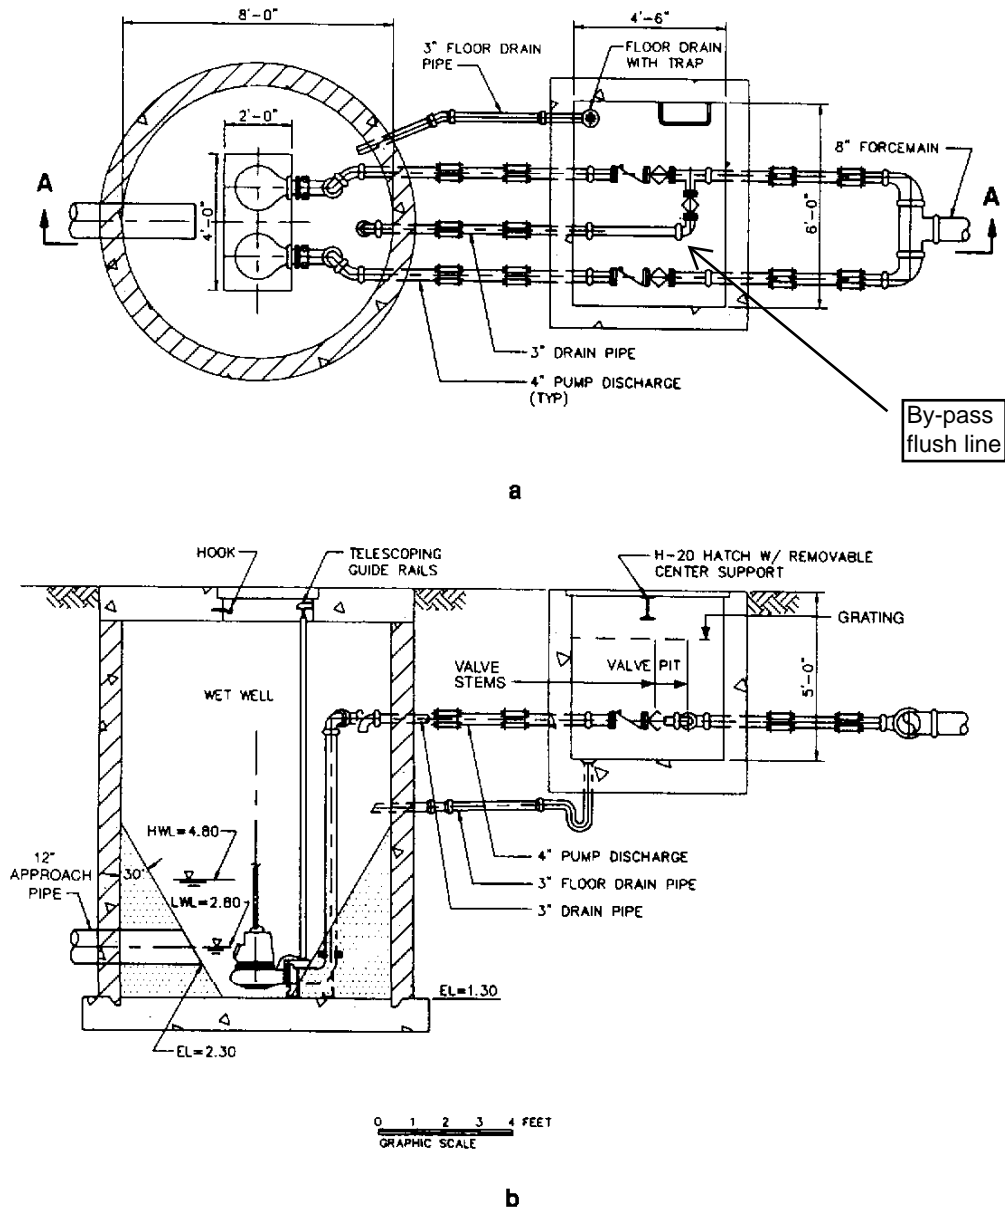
Layout of redesigned Clyde pumping station. (a) Plan view; (b) Section A-A.
